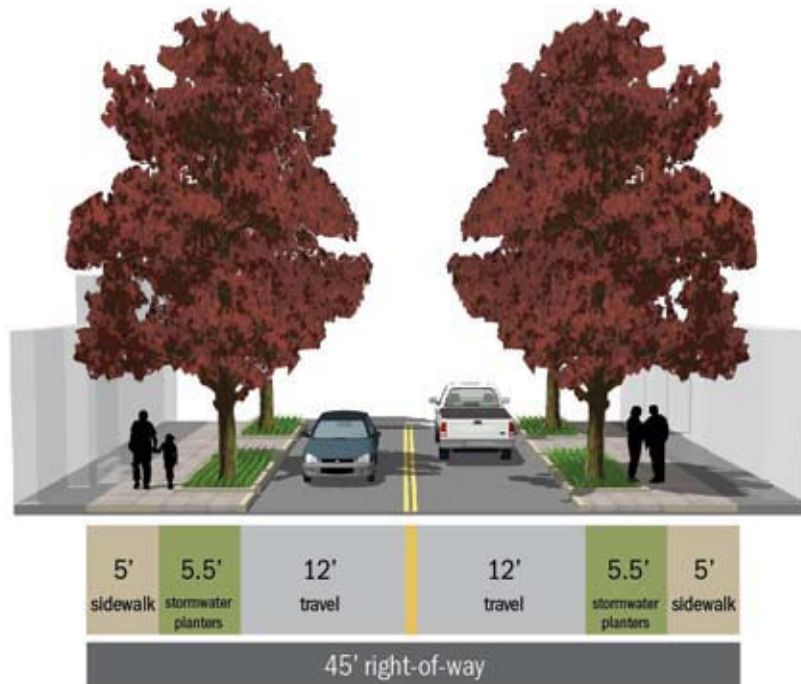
Conceptual Cross-Section for Ochoco Street – East of Main Street within existing right-of-way (looking east)
